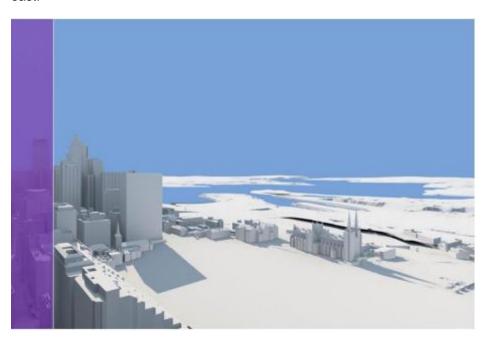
Views from high rise apartments at 27 Park Street to the north-east (OSD envelope in purple)
